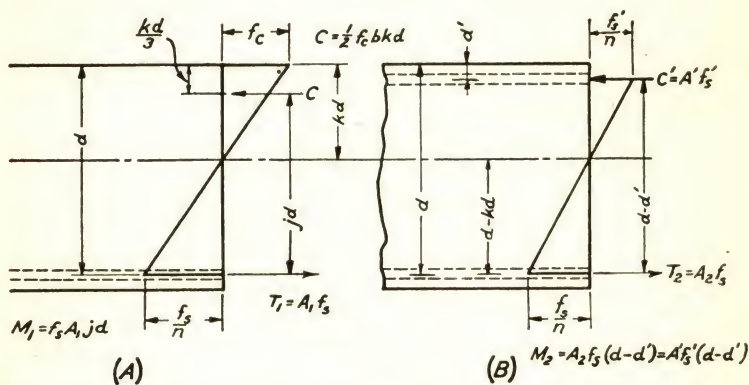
Component Beams Replacing Beam Reinforced with Compressive Steel; (A) Simple Concrete Beam of Balanced Design; (B) Beam Consisting of Balanced Compression and Tensile Reinforcement
